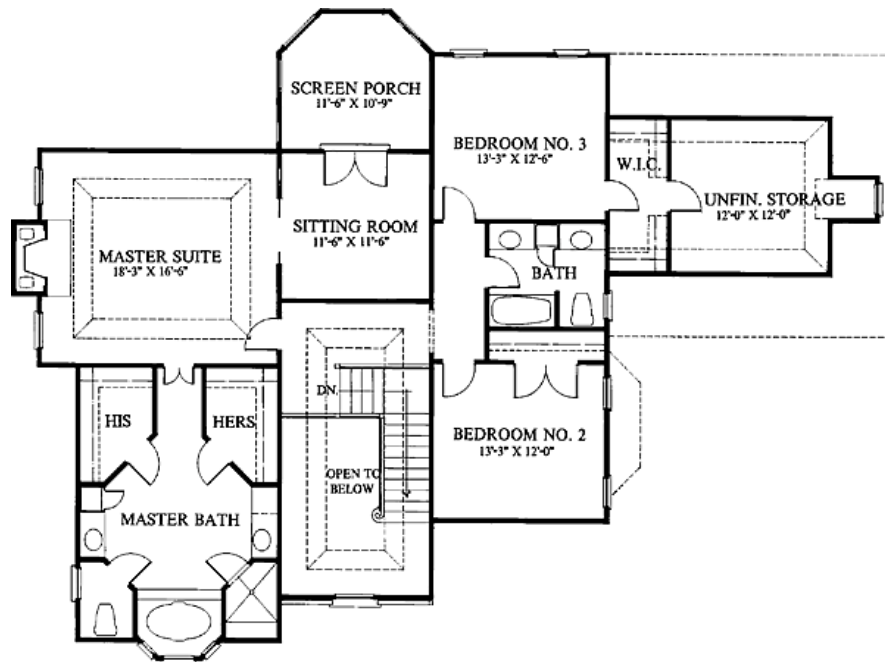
Second Floor Plan (www.dreamhomes.com)
